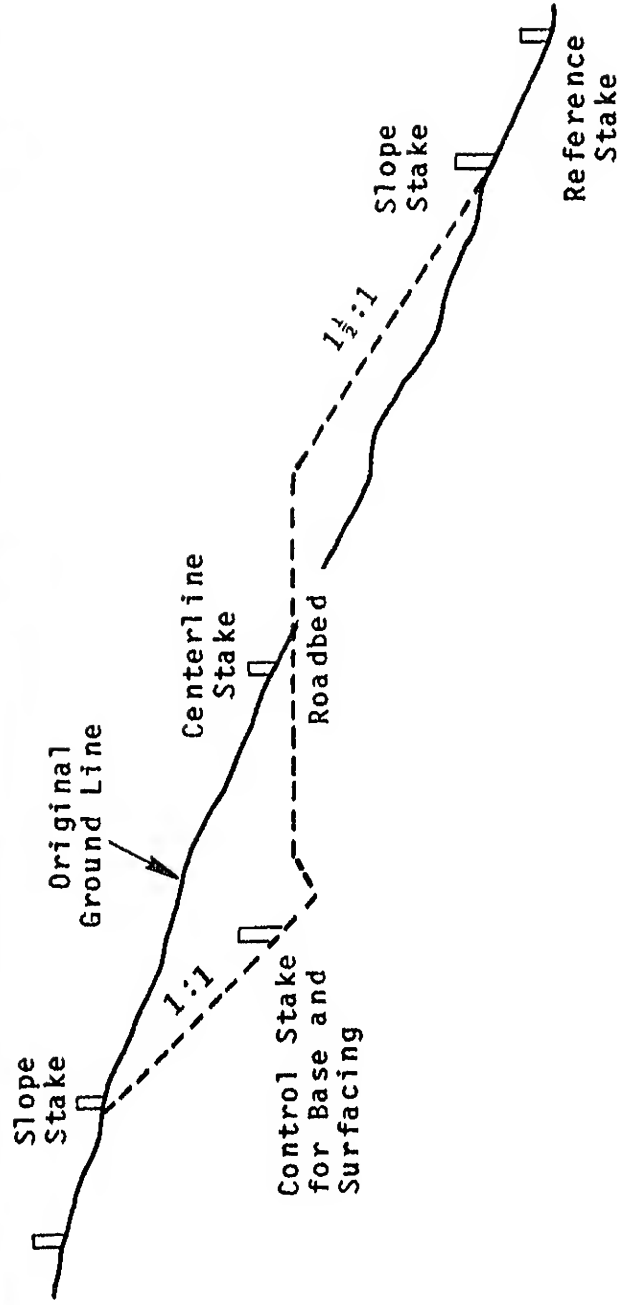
Cross section and stake placement for a typical aggregate-surfaced road.
